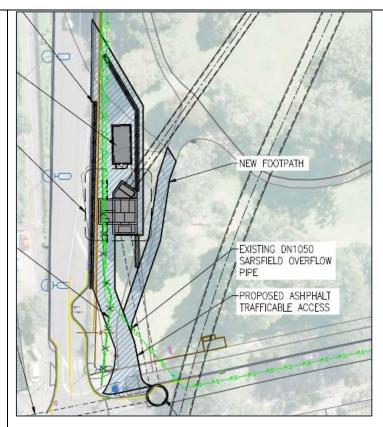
Proposed permanent entry from Sarsfield Street and egress onto Curran Street Site General Layout, Watercare drawing CI-STAT&PLAN, DWG no 2013964.002, issue 2.
